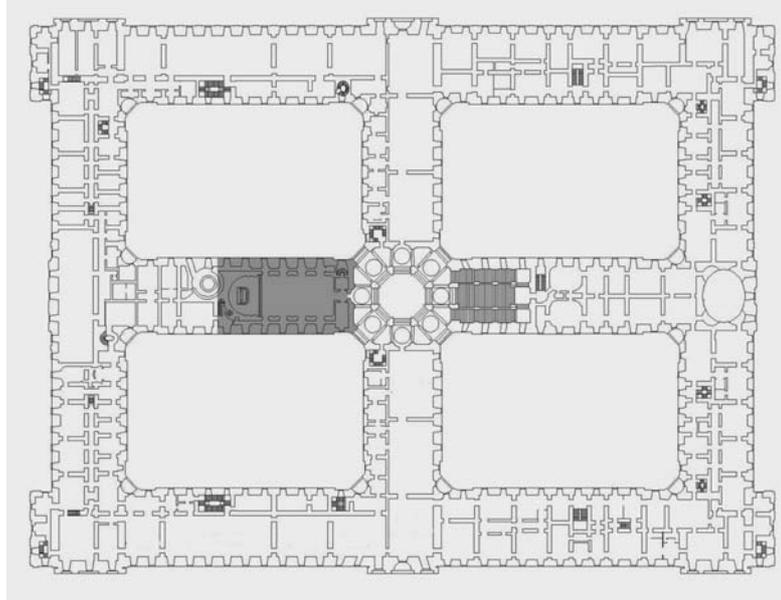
First floor plan of the Royal Palace, with the Palatine Chapel evidenced.
